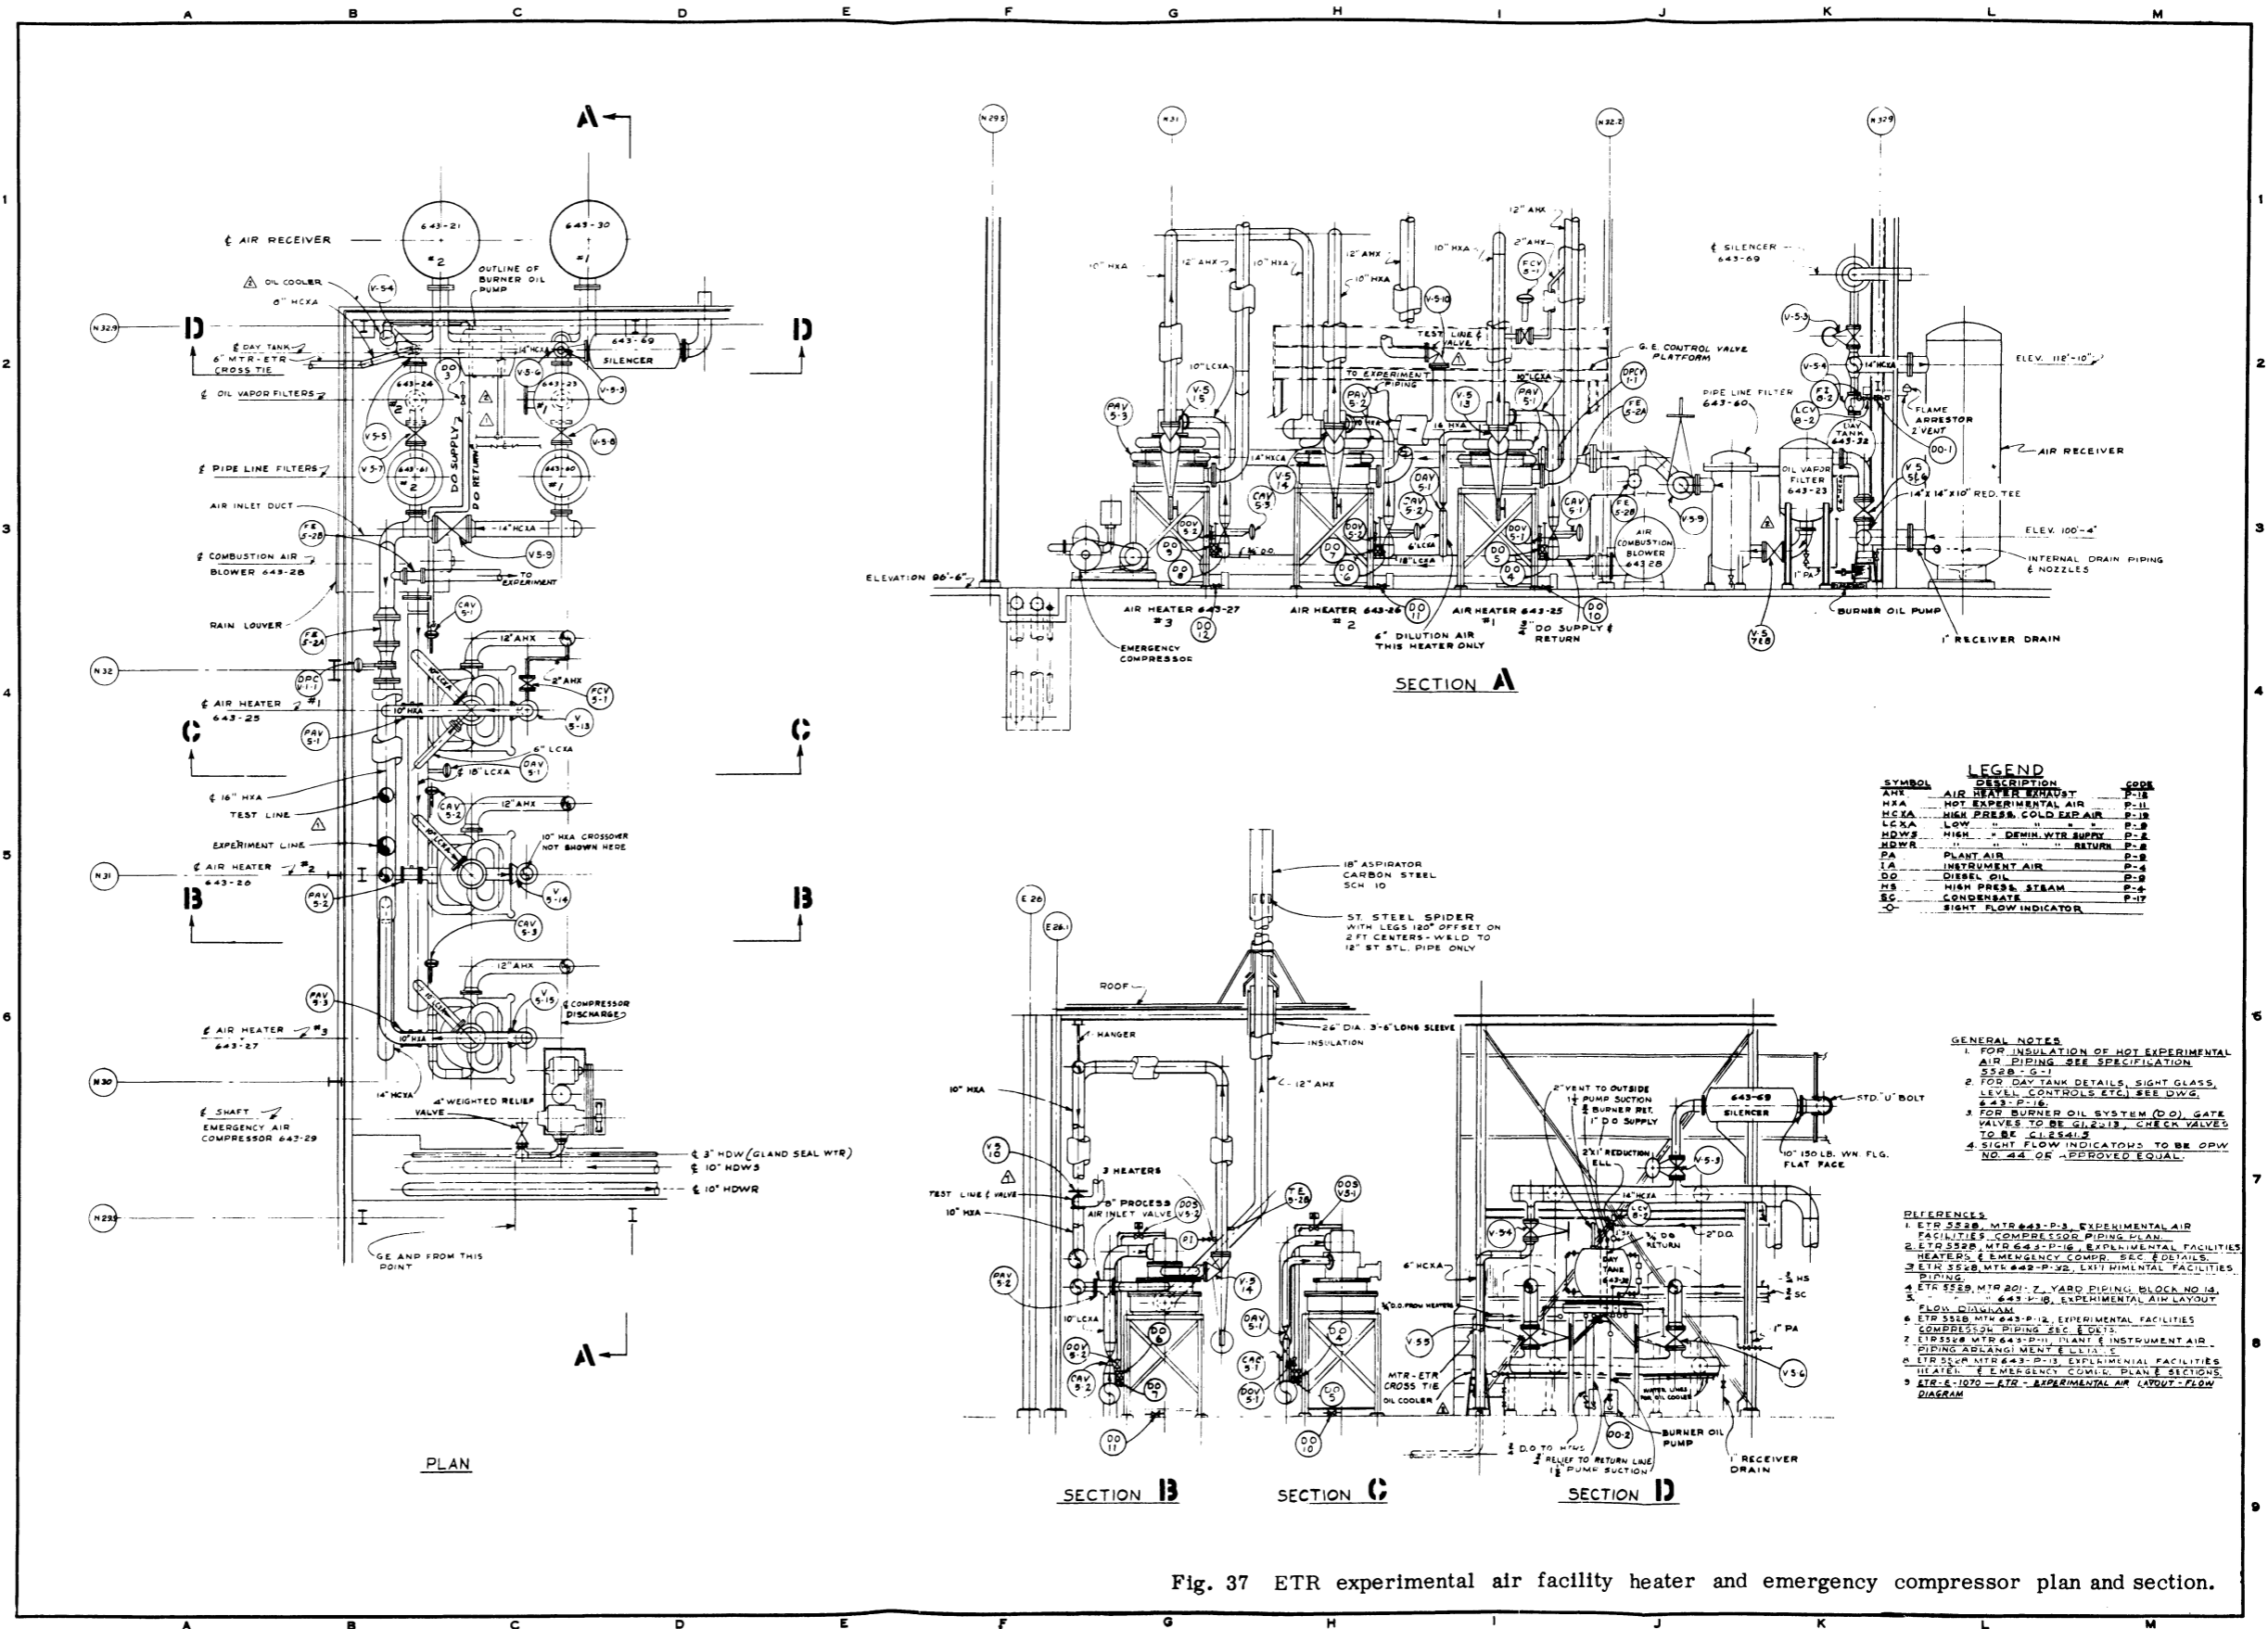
ETR experimental air facility heater and emergency compressor plan and section.
